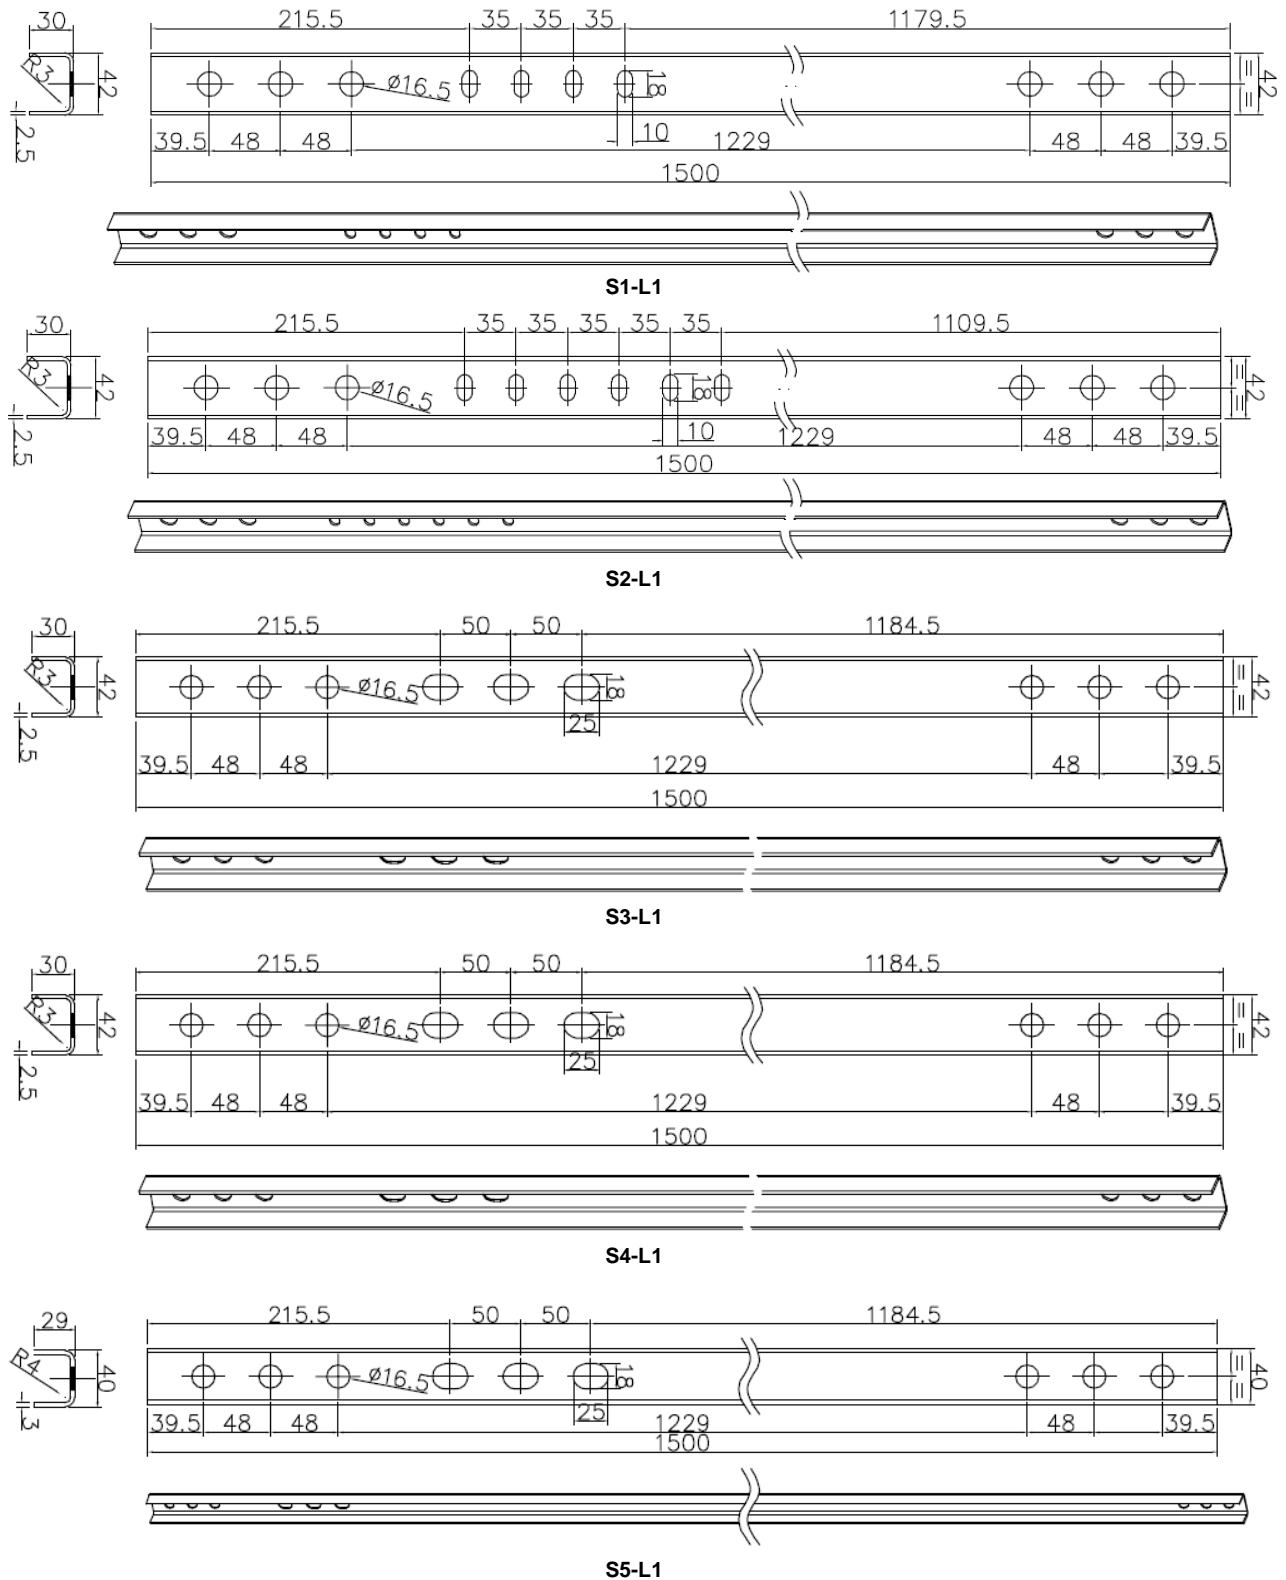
Geometry of the tested bracing specimens (L1=1500 mm). All units in mm.
